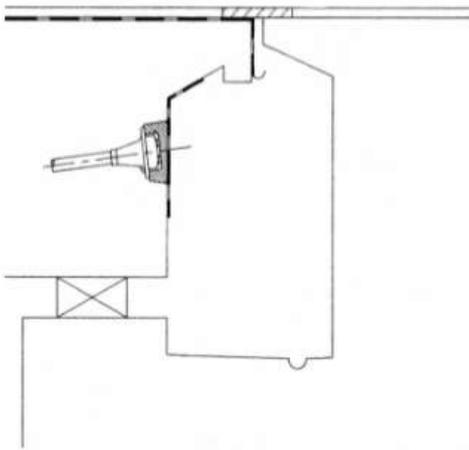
Buried anchorage for internal tendons at end of deck with abutment gallery, or beneath expansion joints, [7]
